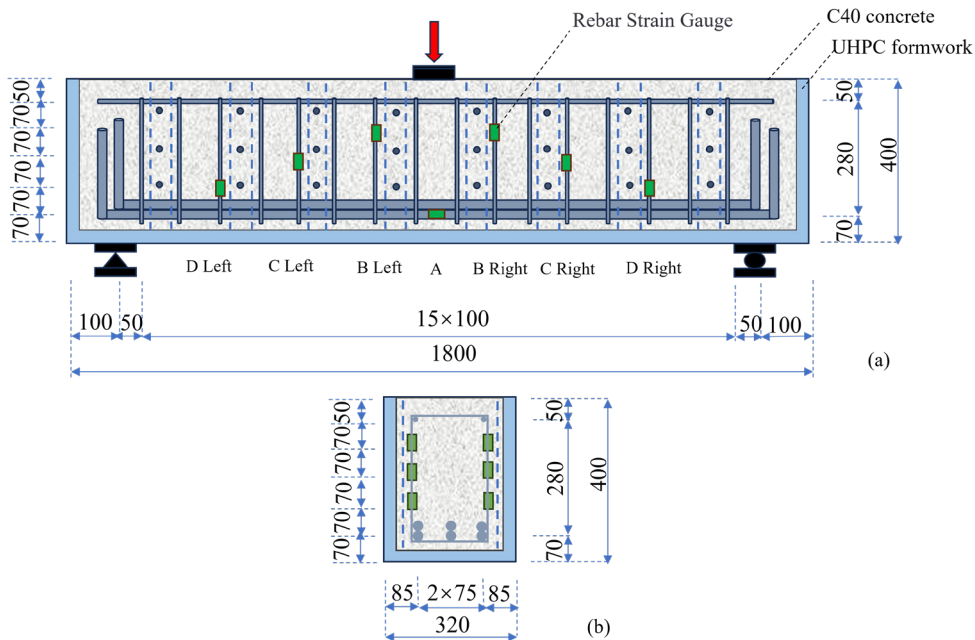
Layout diagram of steel bar strain gauge: (a) front view and (b) side view
